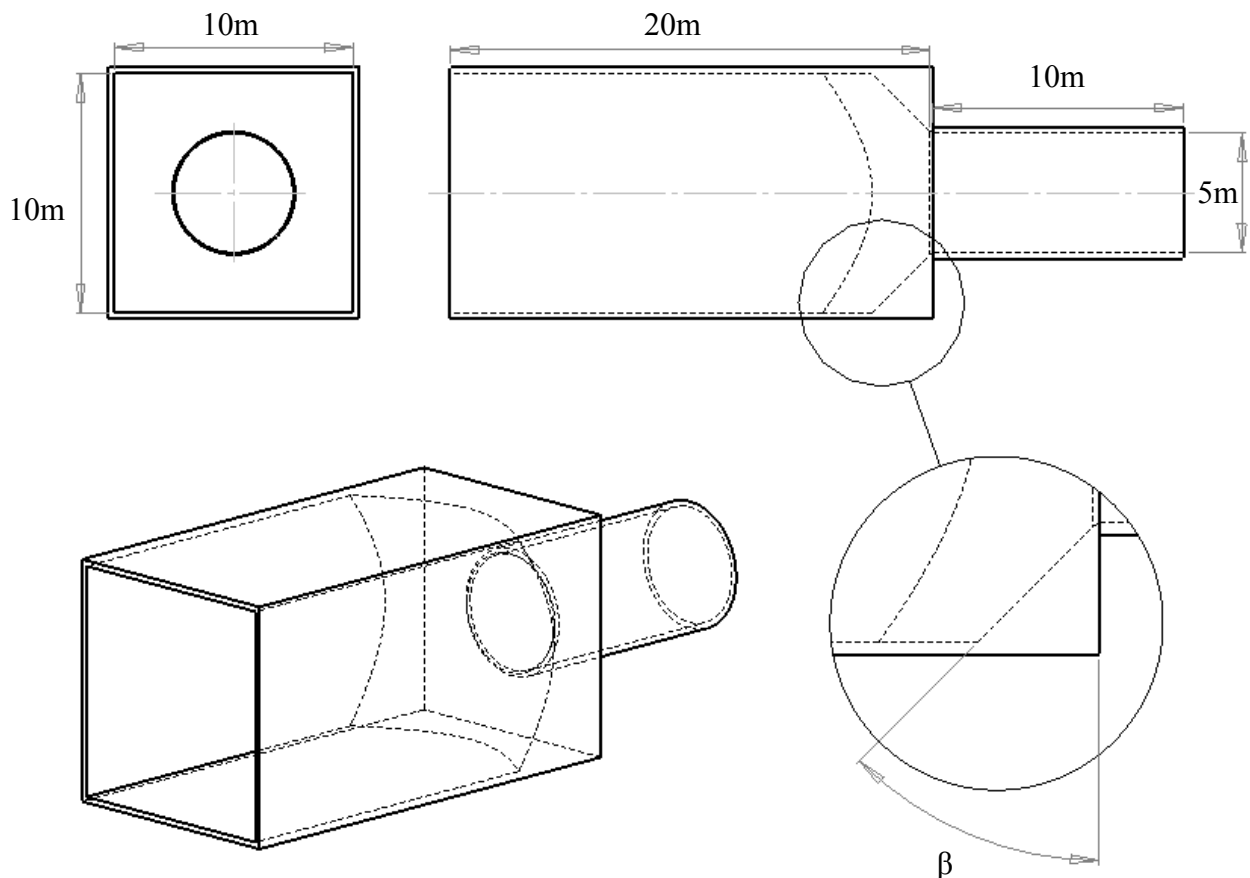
'Round' Ramp Design in the Downstream Corner of the Working Section
